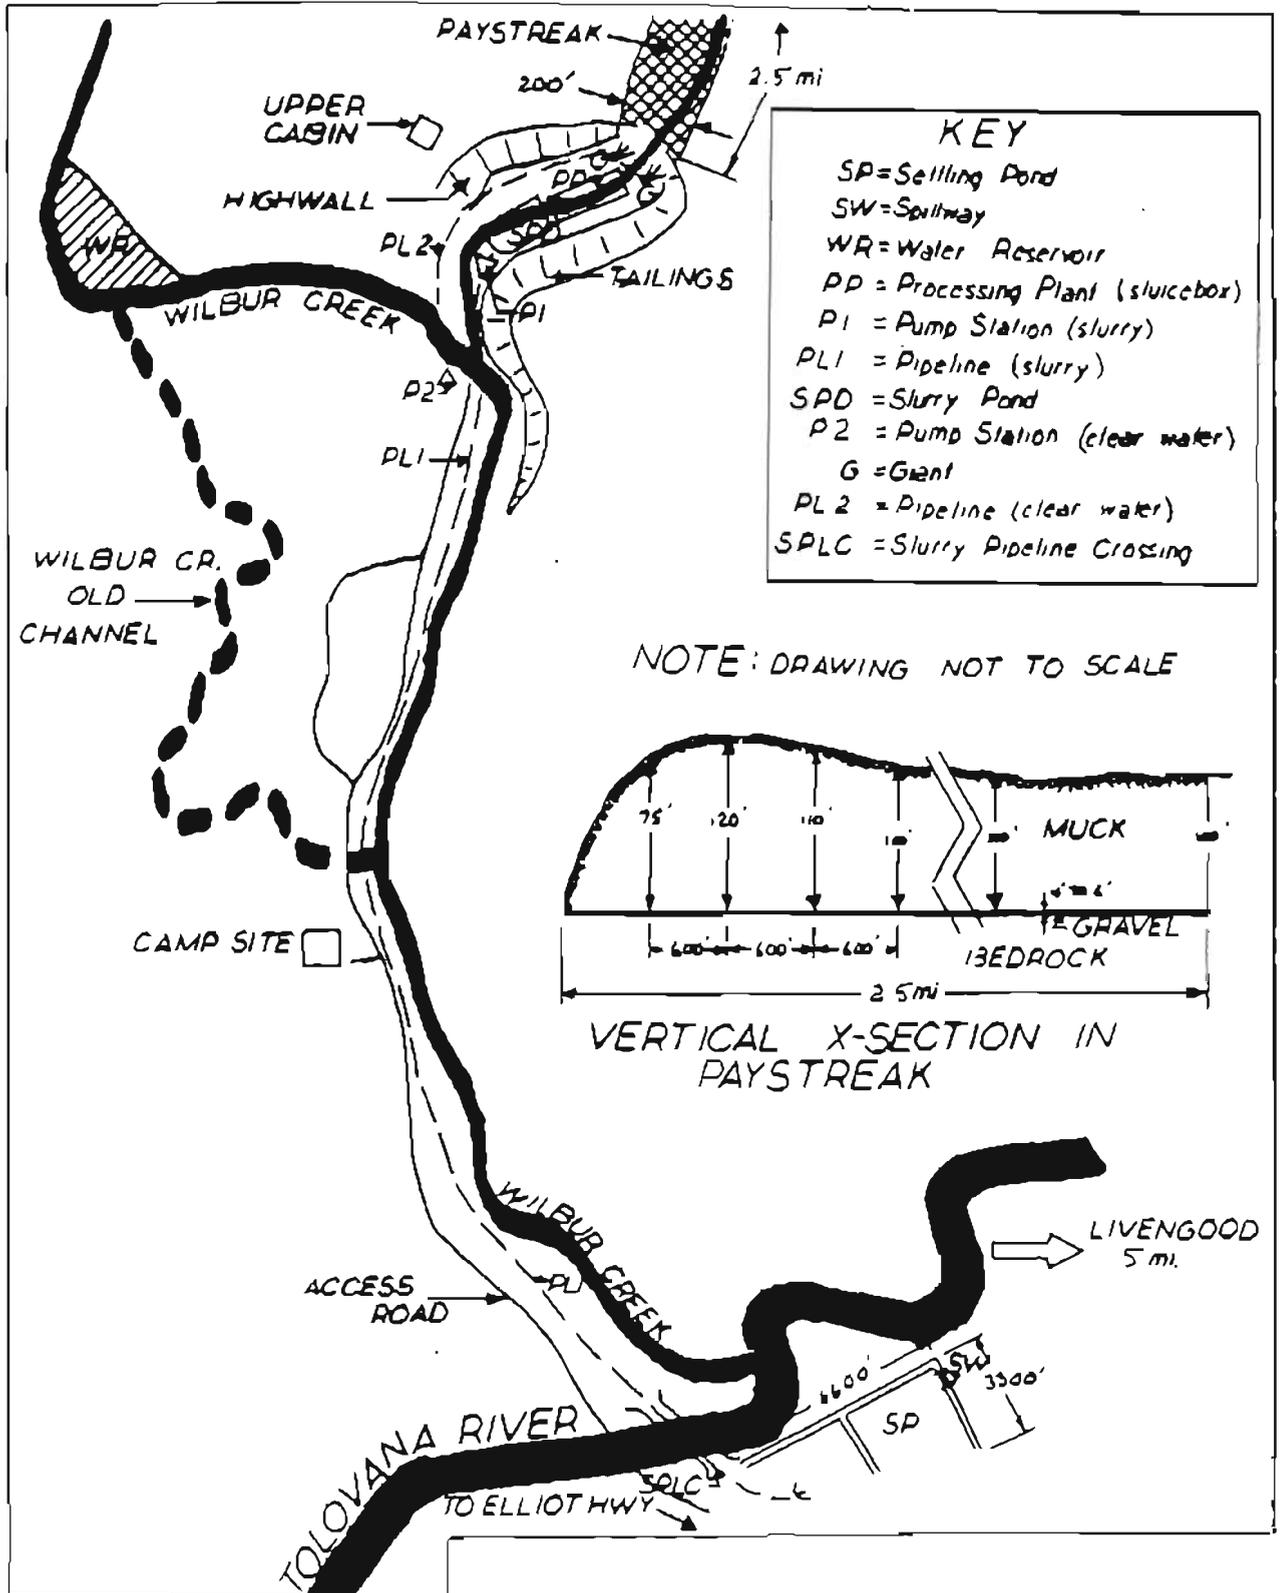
General outline of the Wilbur Creek Mine deposit and conventional technology (hydraulic mining).
